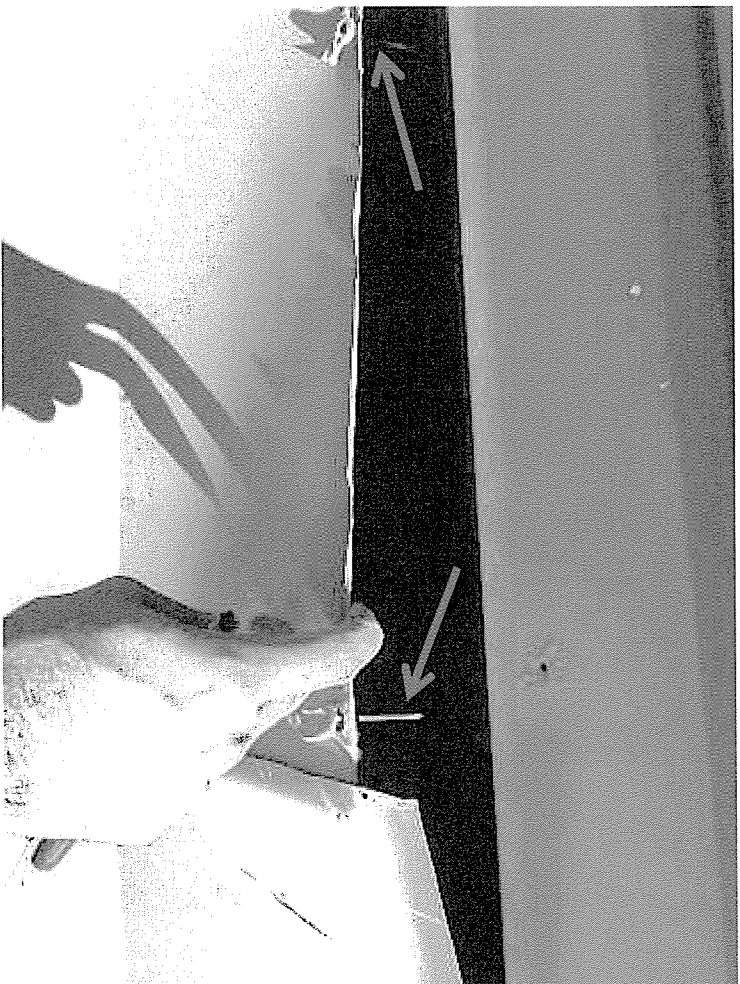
Corroded Fasteners at Detached Flashing
